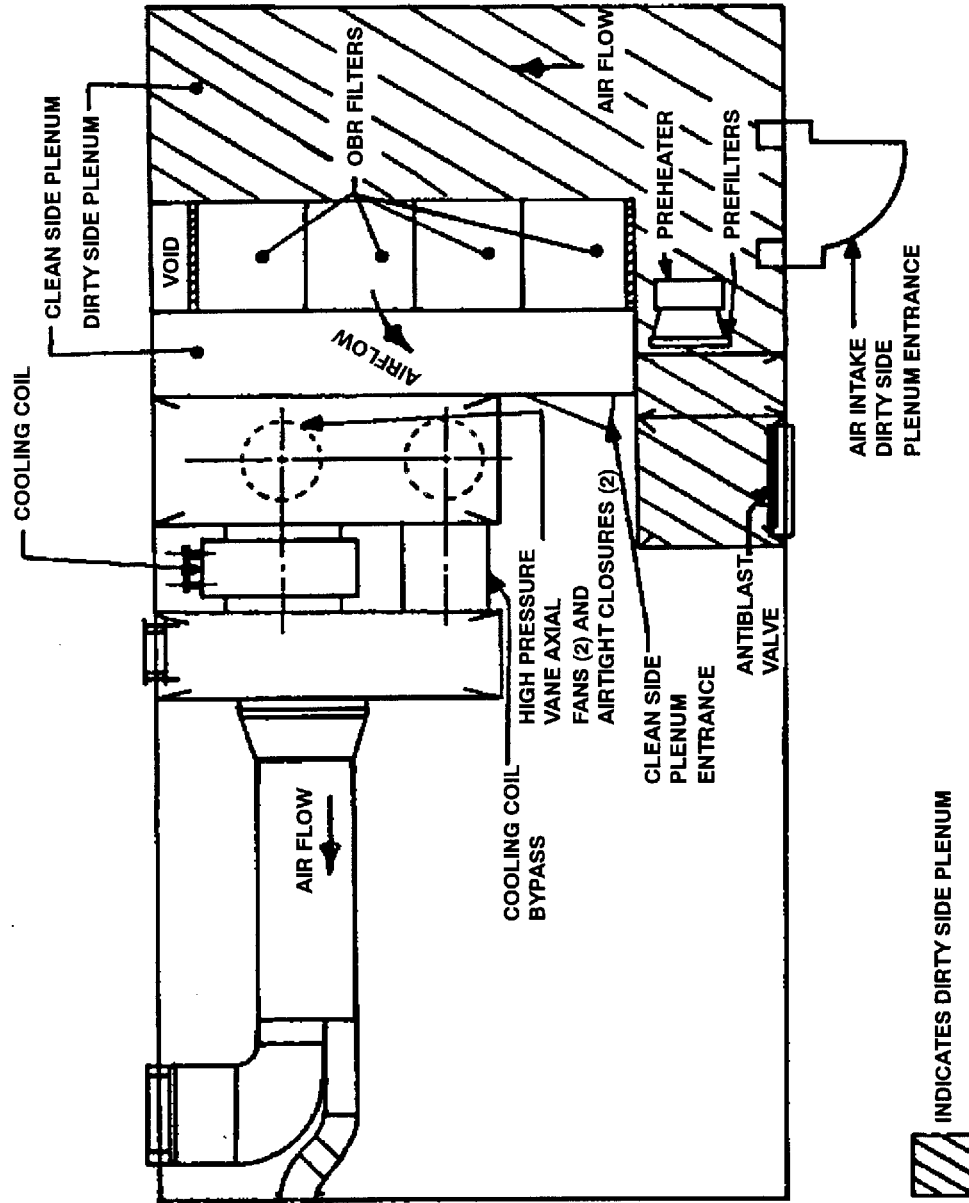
TP Supply Fan Room Example Layout (Plan View)
